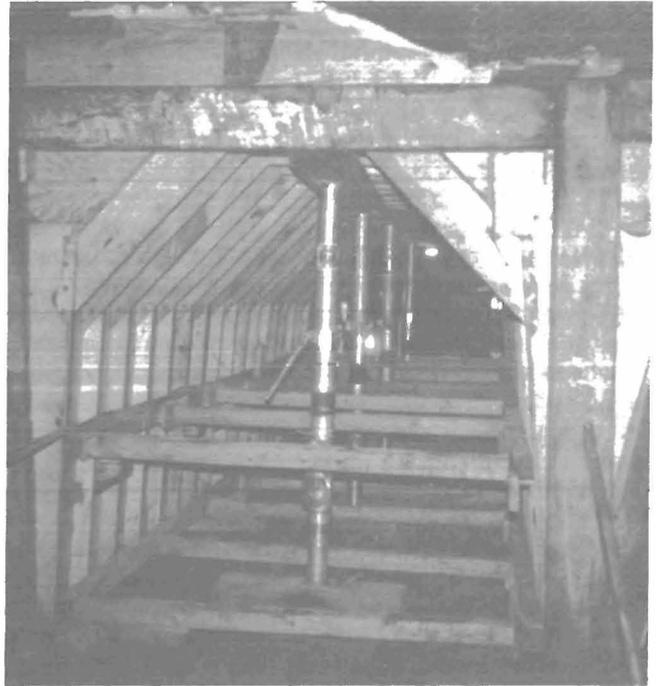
Completed plywood formwork as erected in the field. Note use of hydraulic jacks to support formwork.
